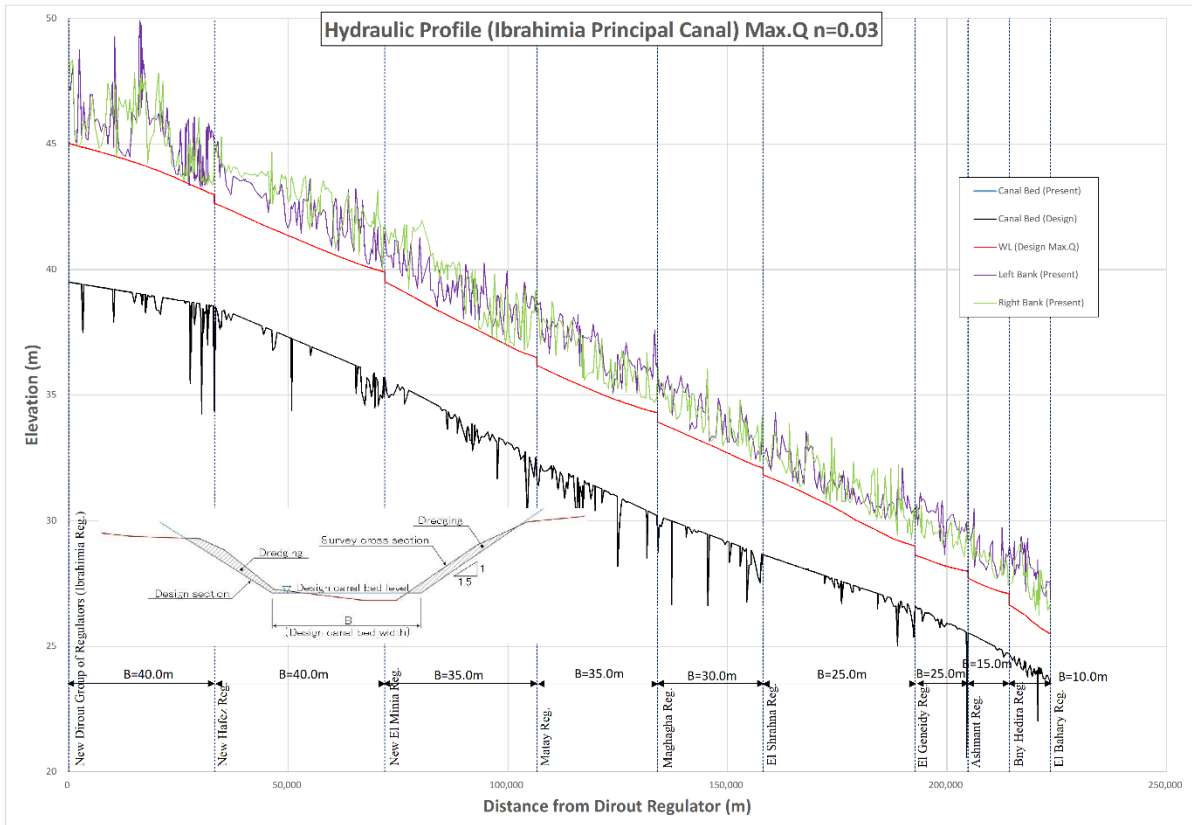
Hydraulic Longitudinal Section of Ibrahimia Principal Canal (Maintenance Plan: Max.Q)
